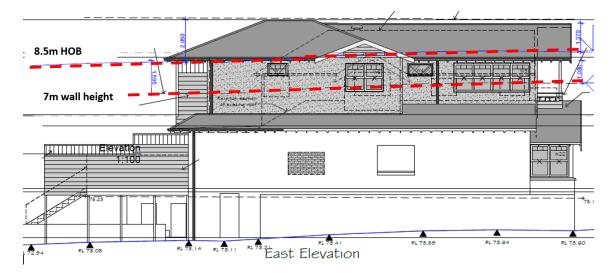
East elevation showing correct HOB and Wall Height controls and the exceedance
